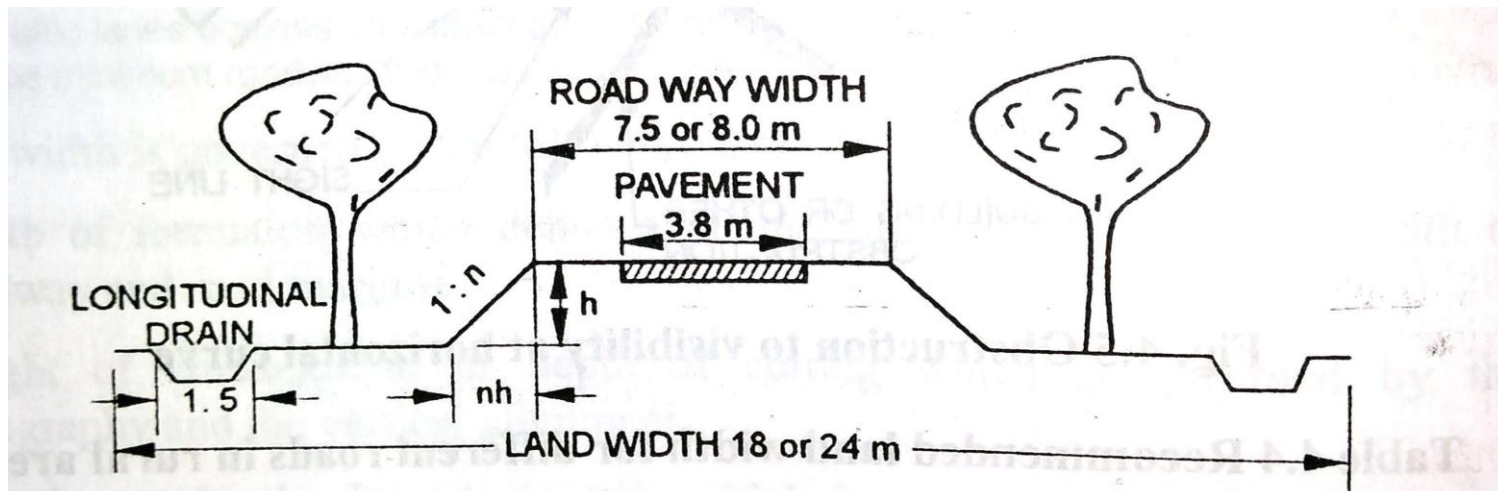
Cross section of VR or ODR in embankment in rural area
